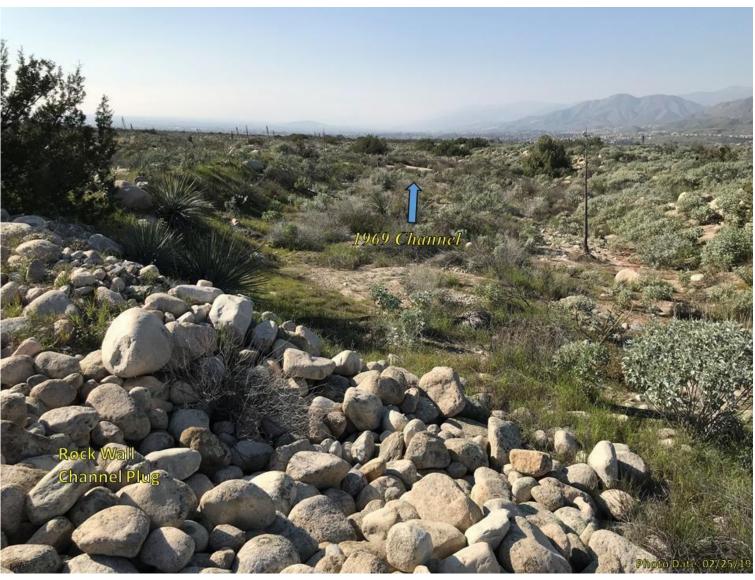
Photo View to the Northwest from Atop the Rock Wall Channel Plug Looking Down the 1969 Channel
